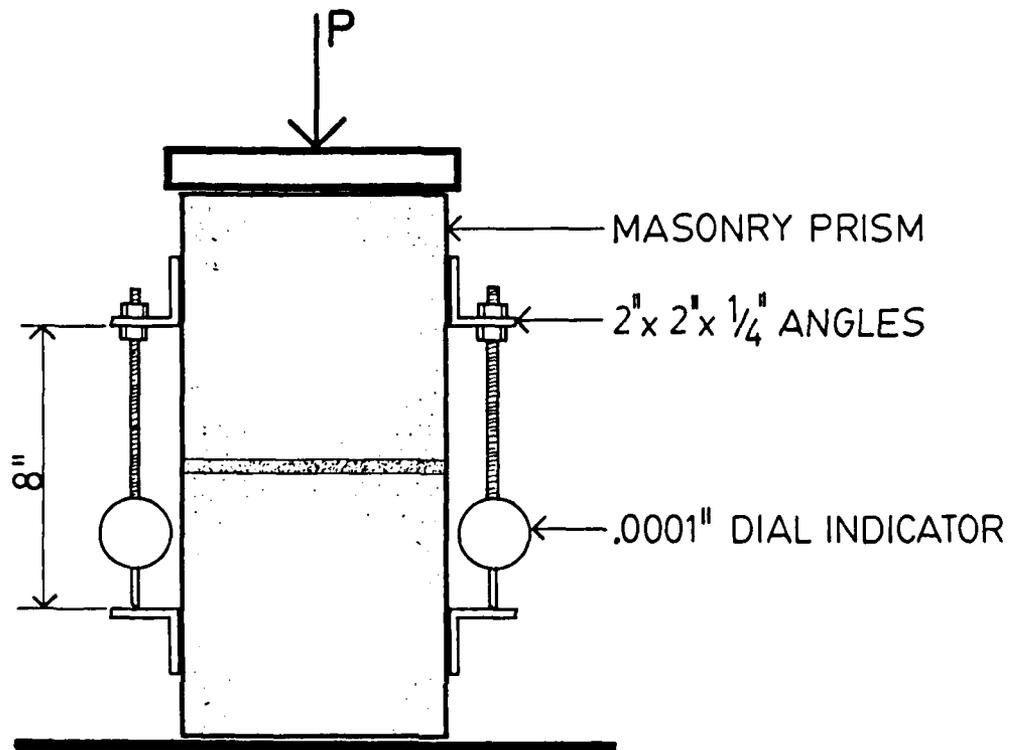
Method Used to Measure Deformation of Masonry Prism Tested in Compression.
